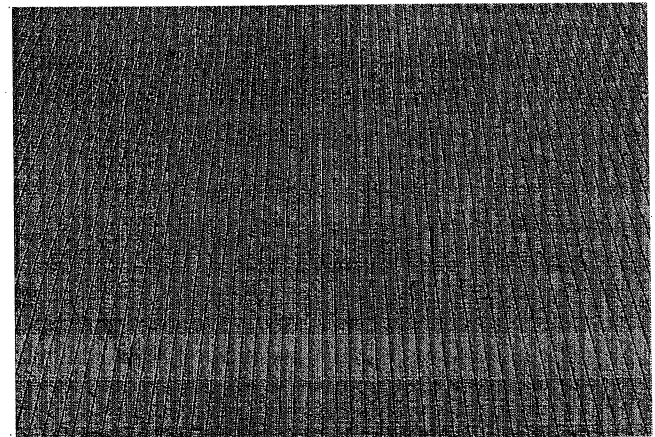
Sample from typical Wisconsin tined pavement site.
